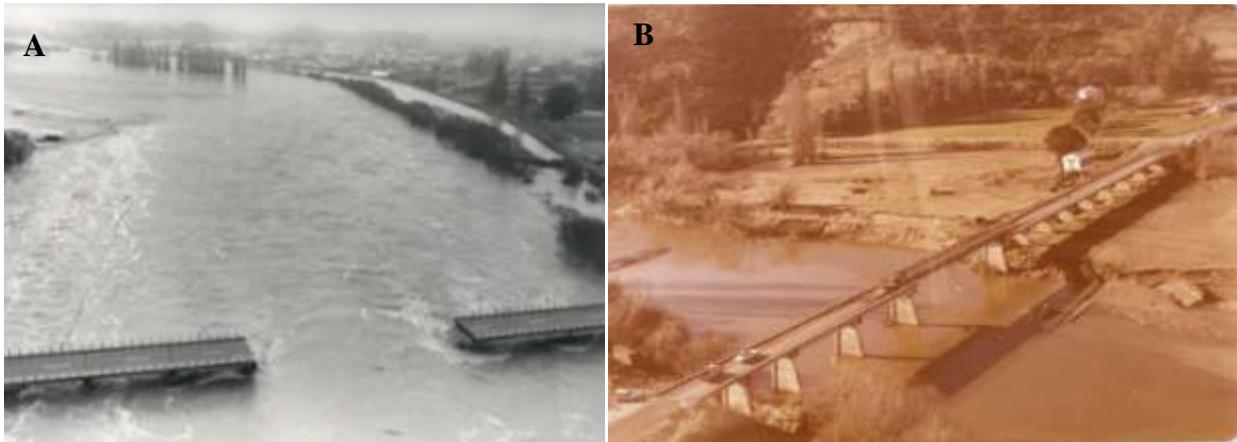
A. Outram Bridge during the June 1980 flood (6 June at 3pm); B. Outram Bridge, with temporary Bailey bridge constructed post-event.
